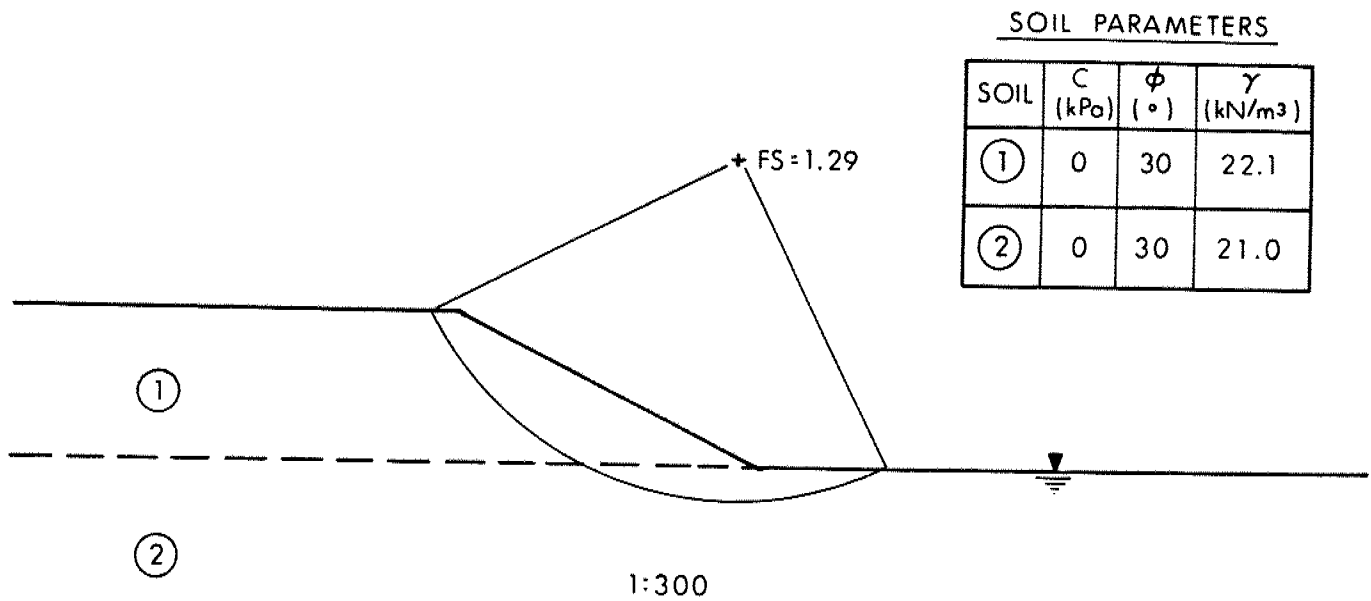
A - 6m EMBANKMENT - SHALLOW SEALED STABILITY-TOTAL STRESS
